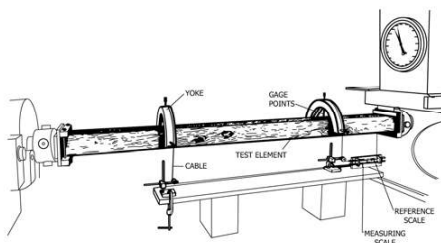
Example of Torsion Test of Structural Member in a Universal-Type Test Machine
